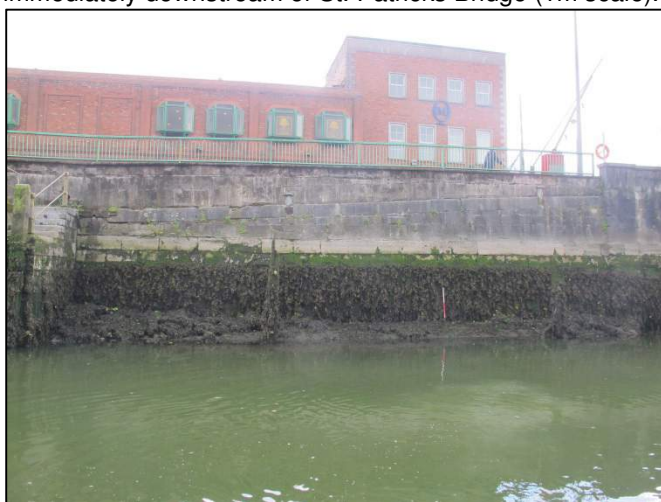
South-facing view of section quay wall forming Merchant's Quay (1m scale).
